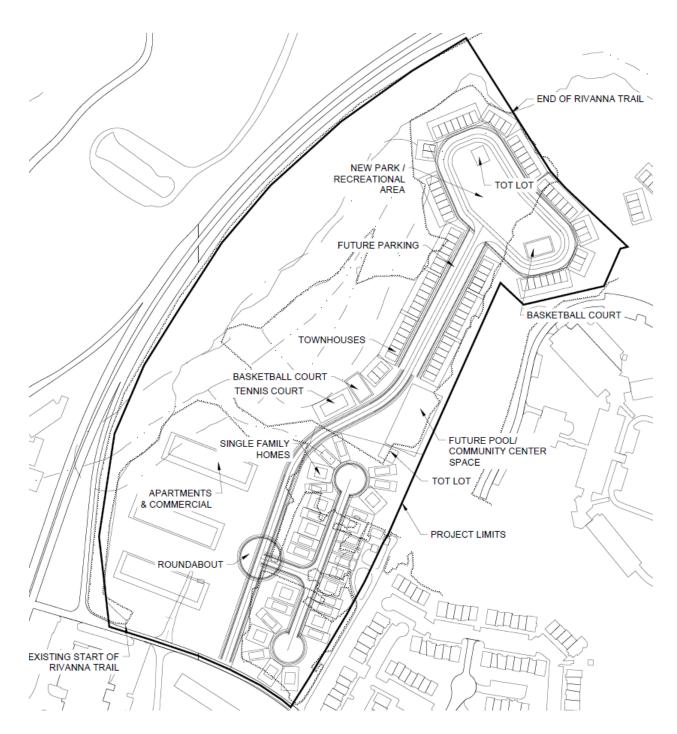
Preliminary Site Plan 50% Completion (October 27, 2023)
